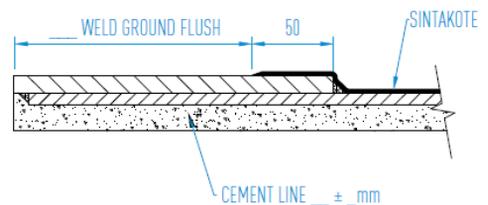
BUILT UP PLAIN END DETAIL USED TO ADAPT TO EXISTING SIZE
